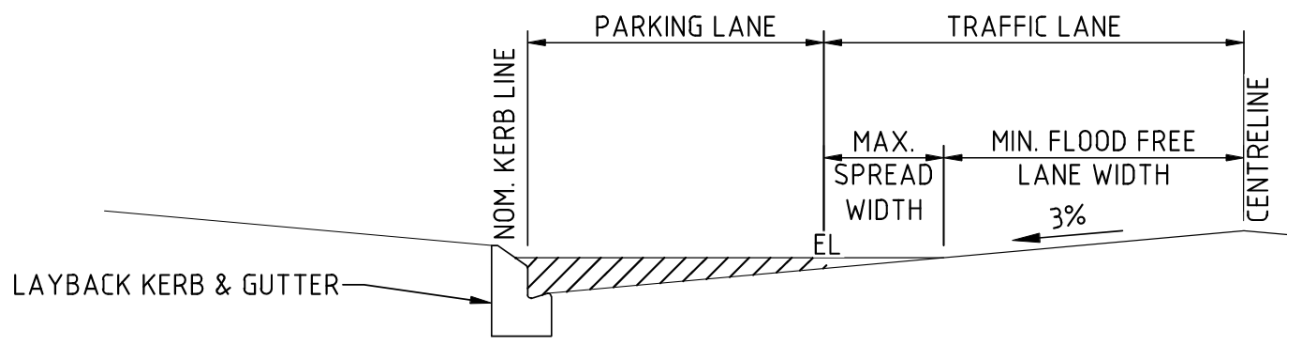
Spread Width – Streets with on-street Parking - Option 1
